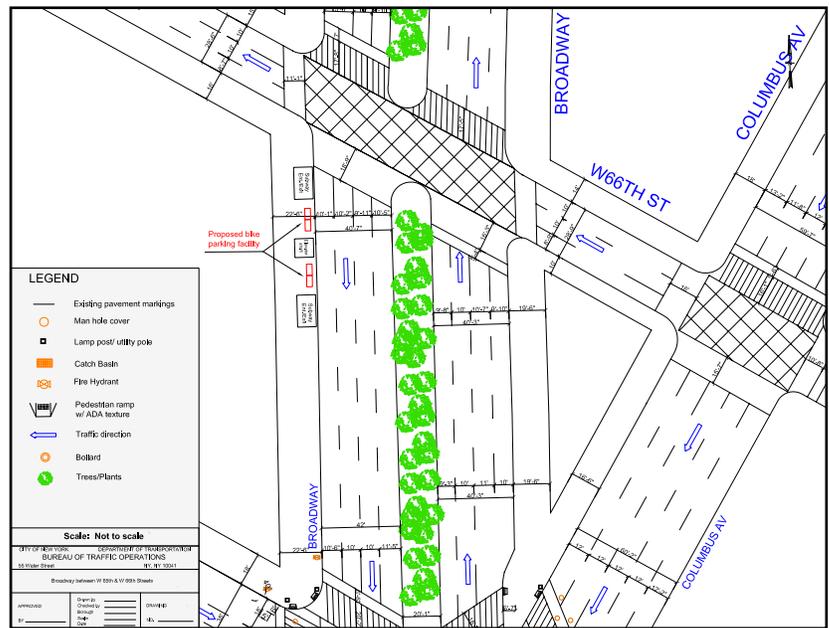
Proposed Sidewalk Bicycle Parking – Broadway between West 65th Street and West 66th Street
